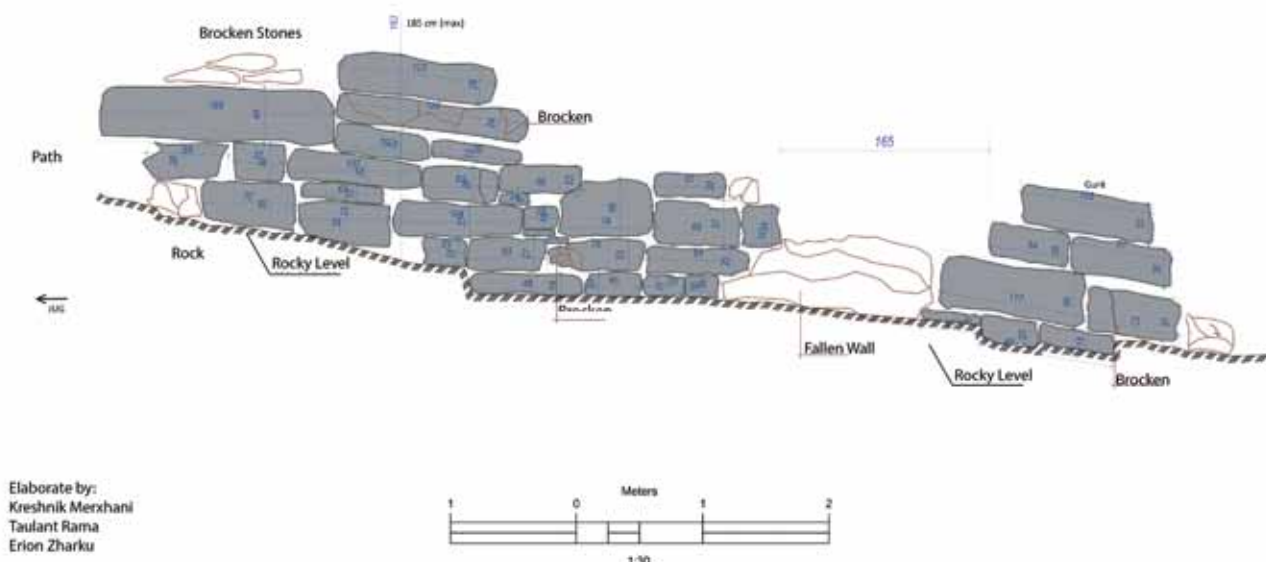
Front view of the fortification wall on the Çeka ridge (made by: K. Merxhani, T. Rama, E. Zharku)
